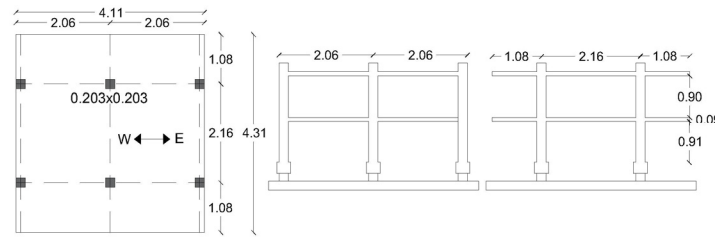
Specimen geometry – Flat-slab multi-story frame [15] (m).
